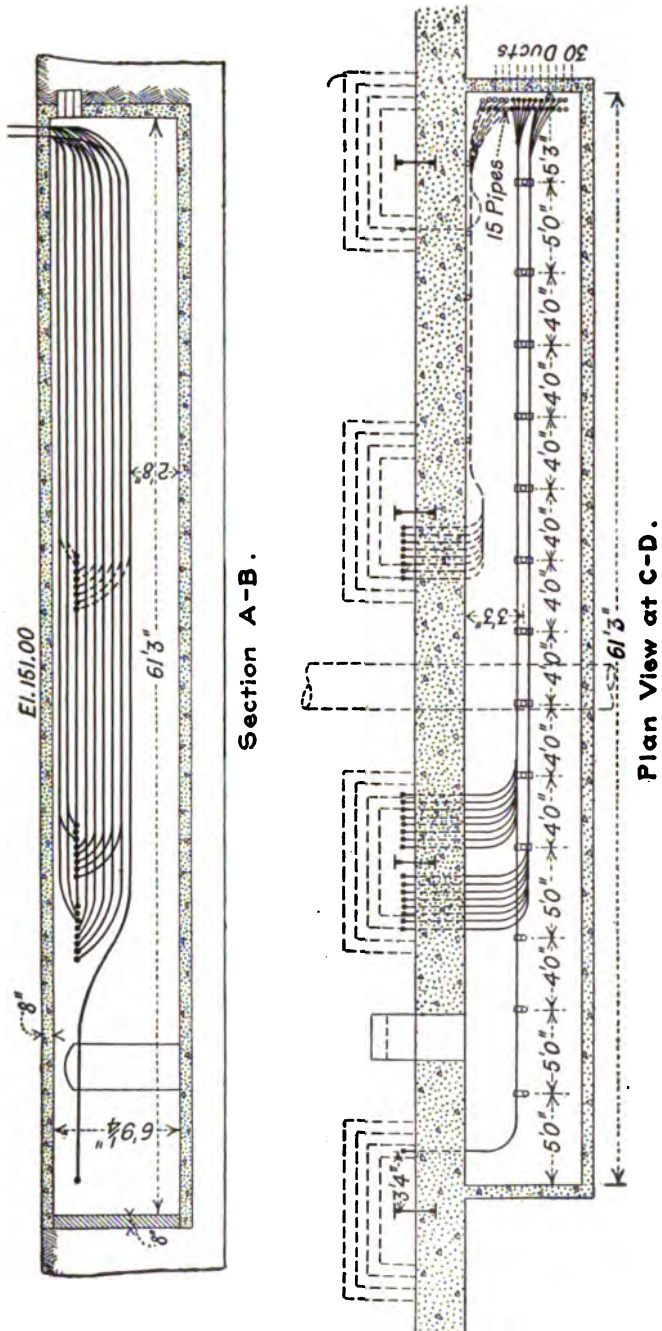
Layout of Cables in Trench (Memphis Street Railway).
